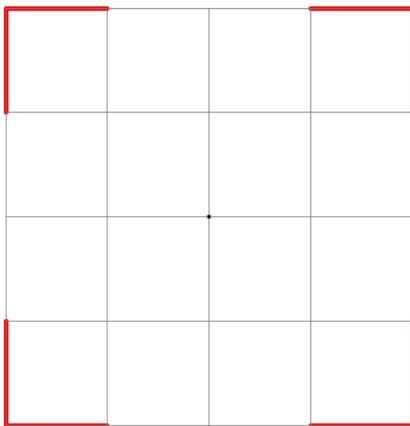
(a) Structural Plan for V-braced RC Frame (Model-7)
